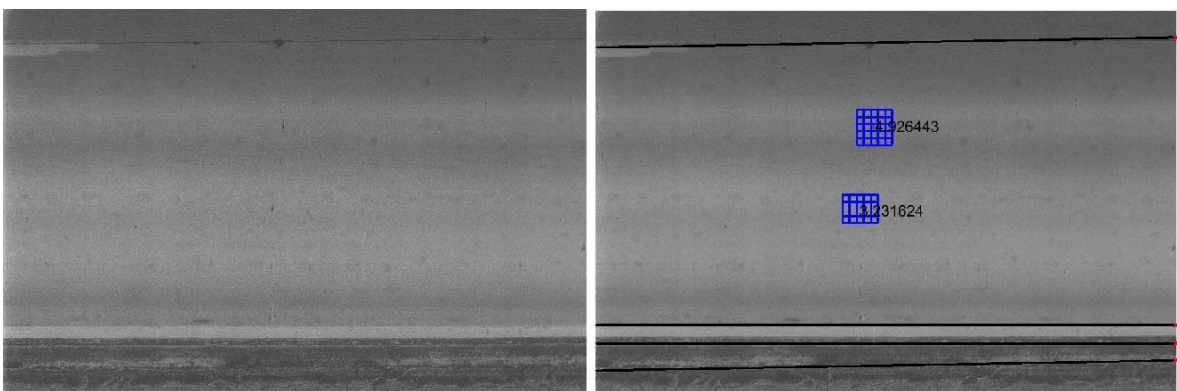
Example of computing crack at low severity: raw crack (left) and crack detection (right)
